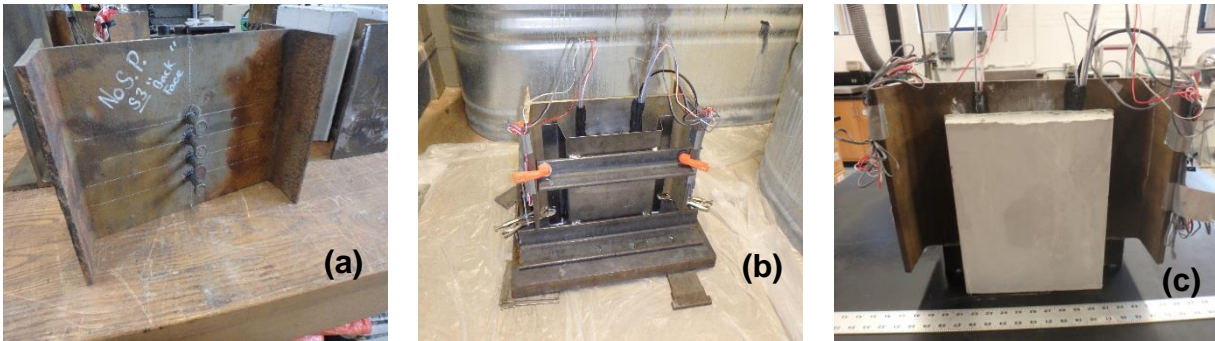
(a) Beam prior to casting; (b) beam installed into forms; (c) completed push-off sample
